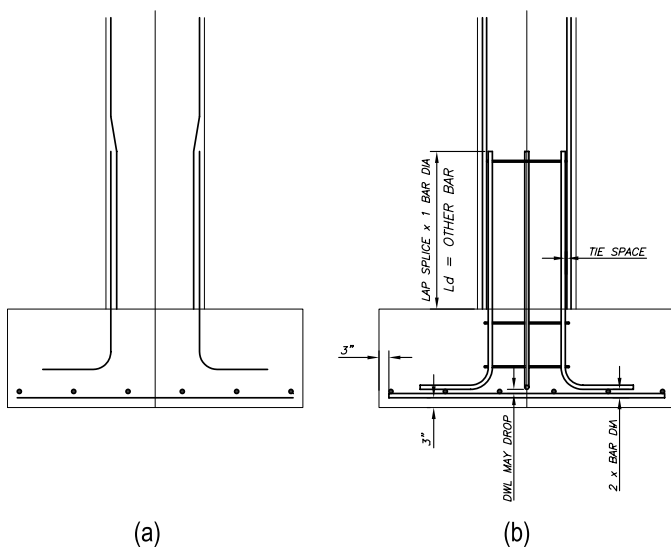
Column and footing detail: (a) as shown in construction documents; and (b) as detailed for constructibility, with dowels supported on the footing reinforcing bars and straight column bars (no offsets) (1 in. = 25.4 mm)
